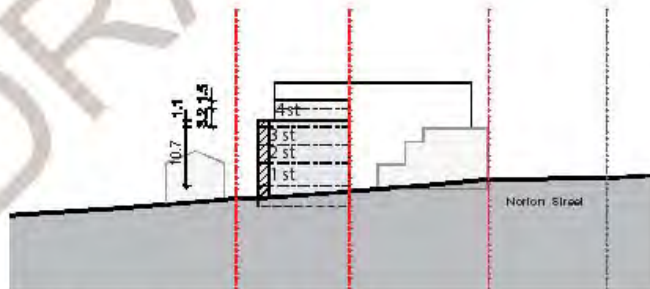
Norton Street - Building envelope - Street Elevation A/A
